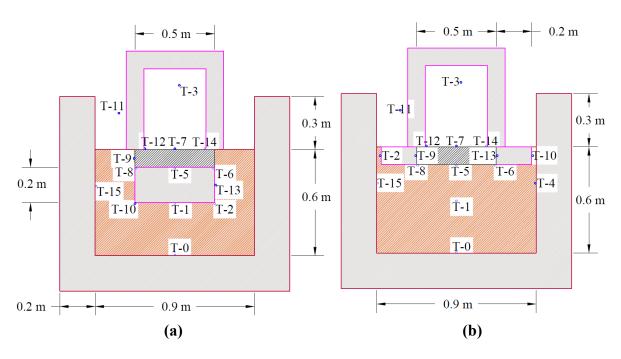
Instrumentation plan for (a) Geofoam Below Foundation, and (b) Geofoam Around Foundation configurations
